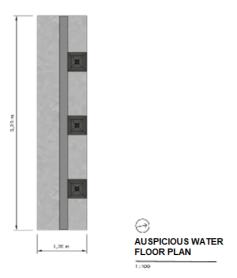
Auspicious water area floor plan (source: studio, 2023)
